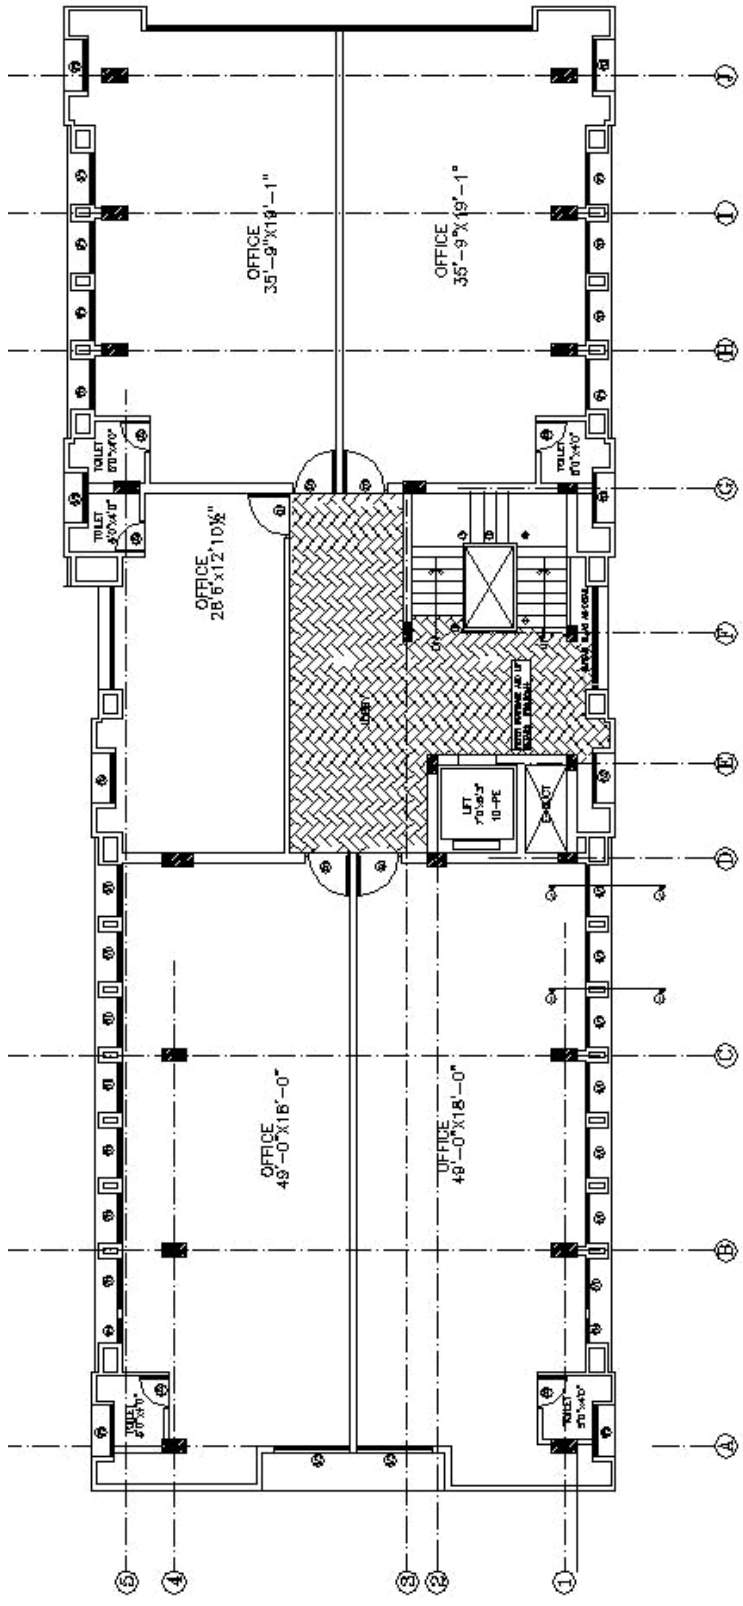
Mahavir Commercial Complex, Hyderabad: Second Floor Plan
